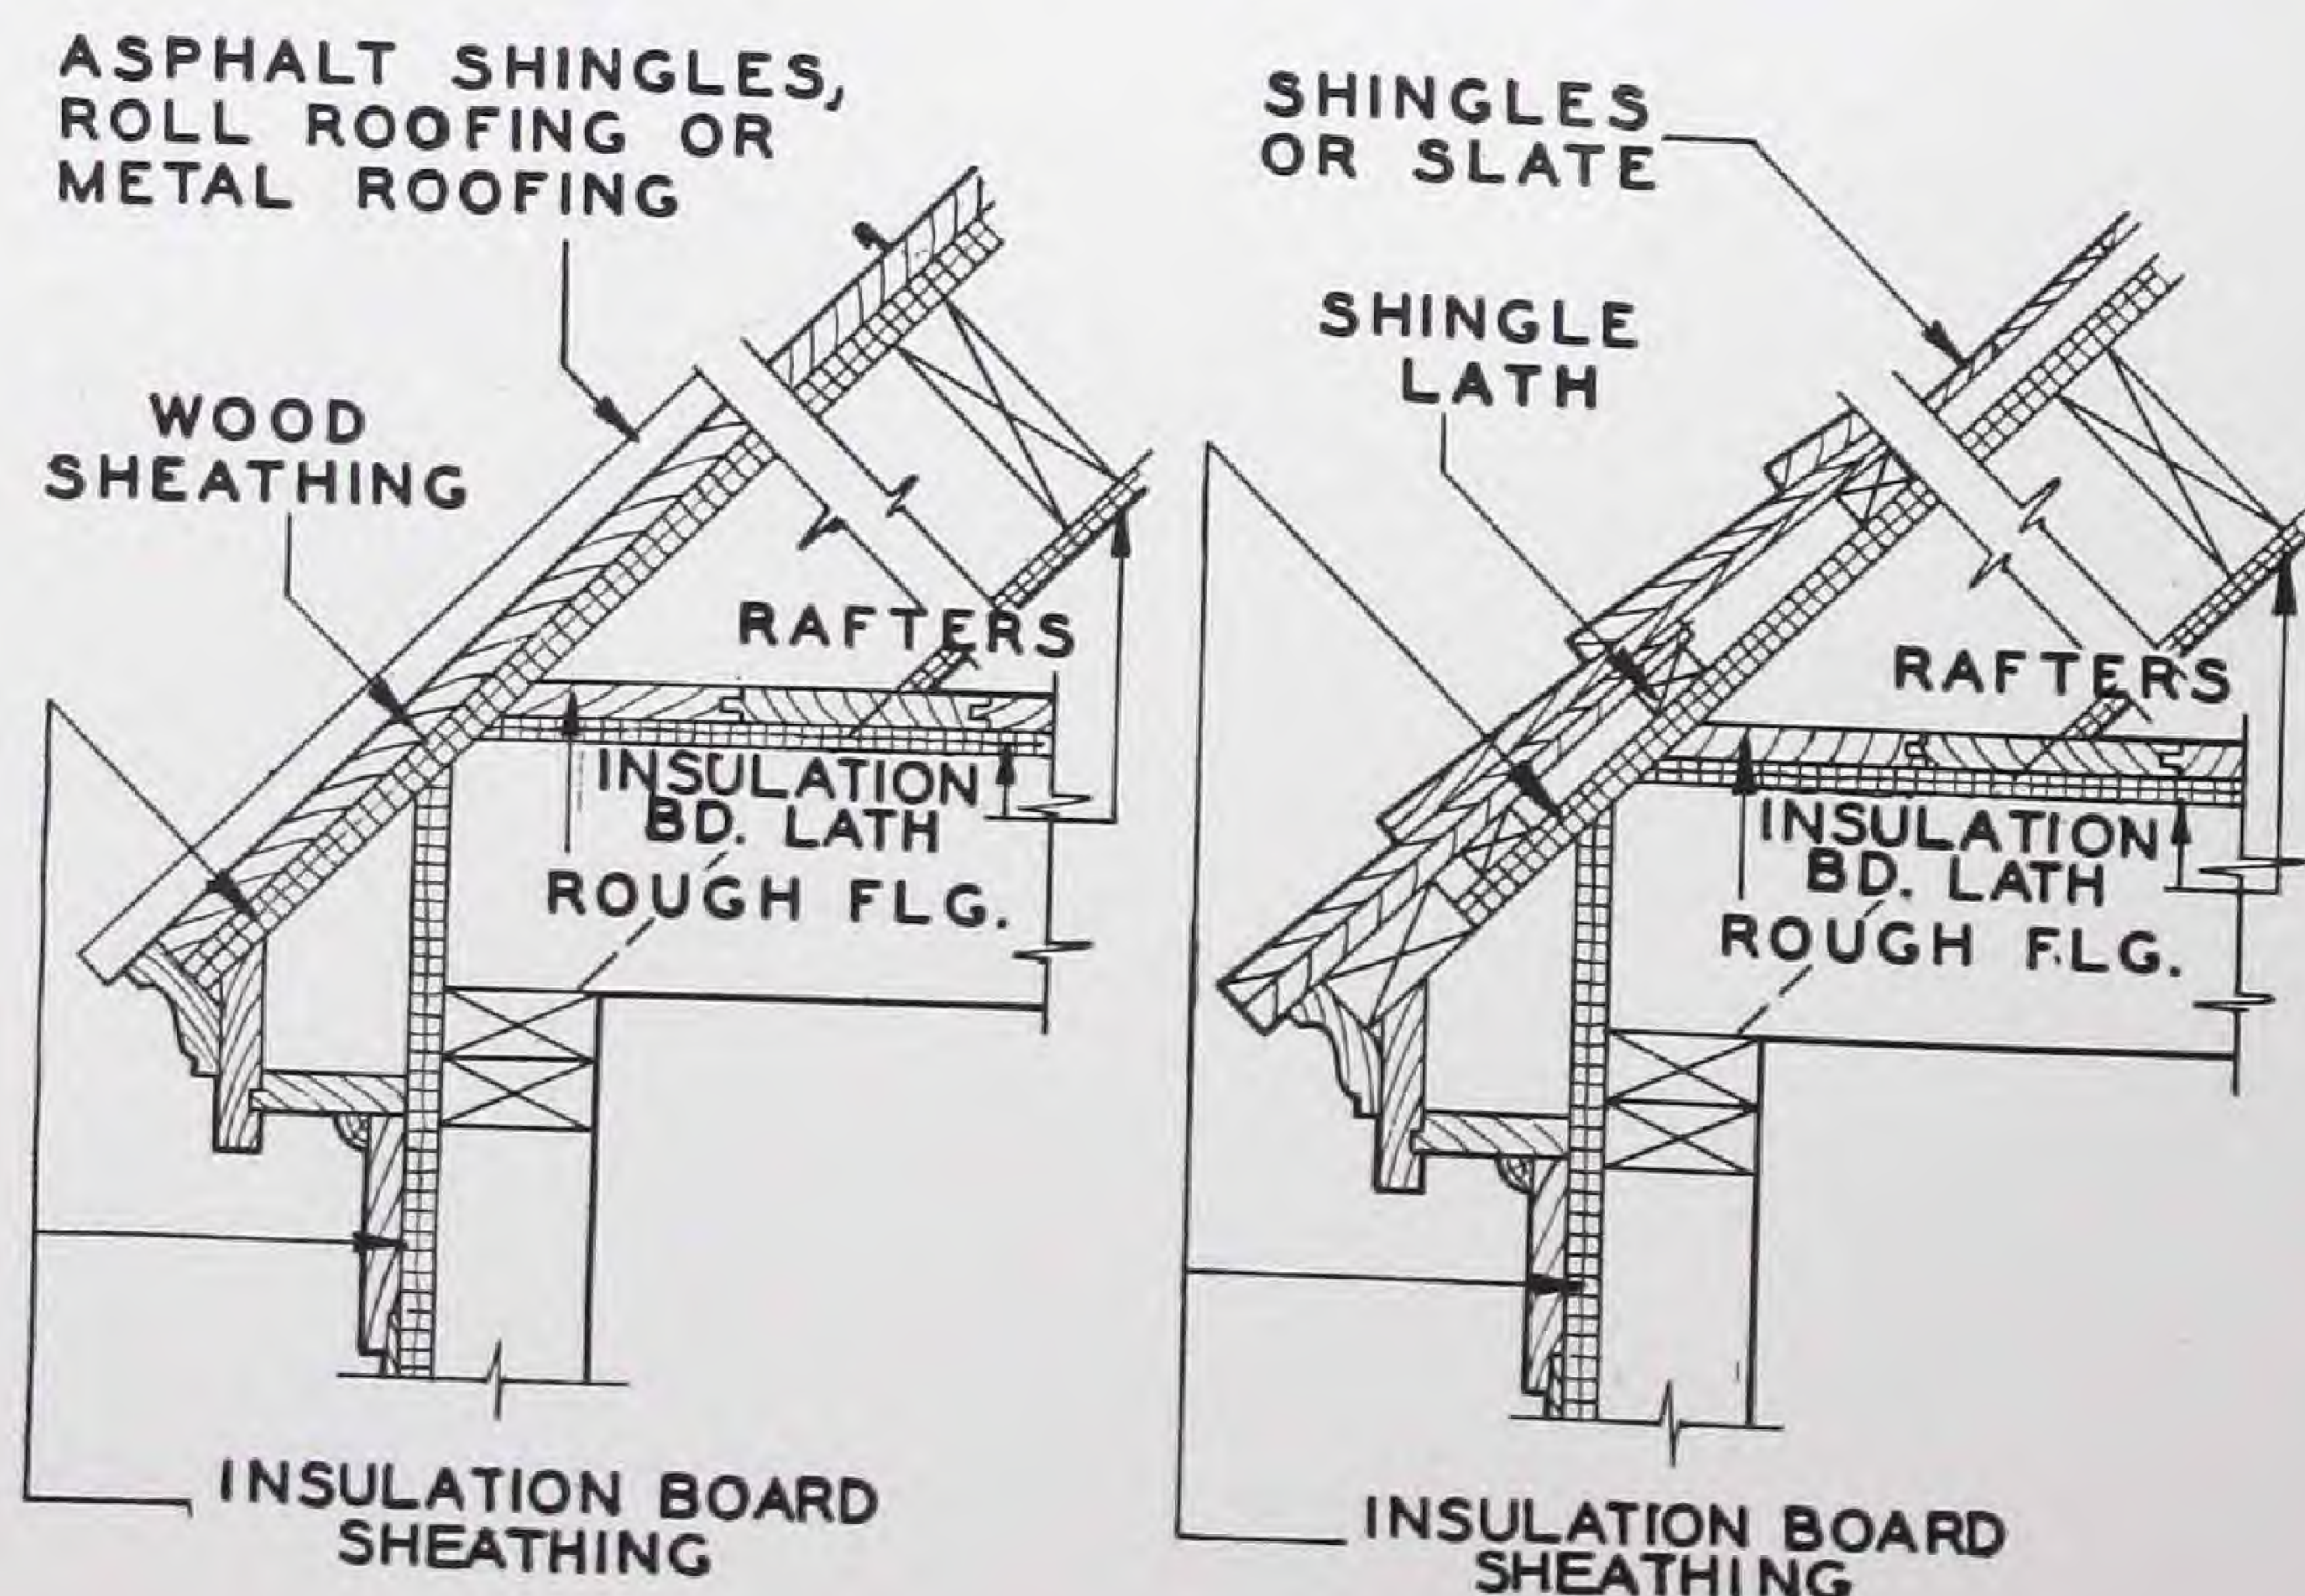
Insulation board on top of roof rafters with roof sheathing or nailing strips (roofers) over the insulation board.
